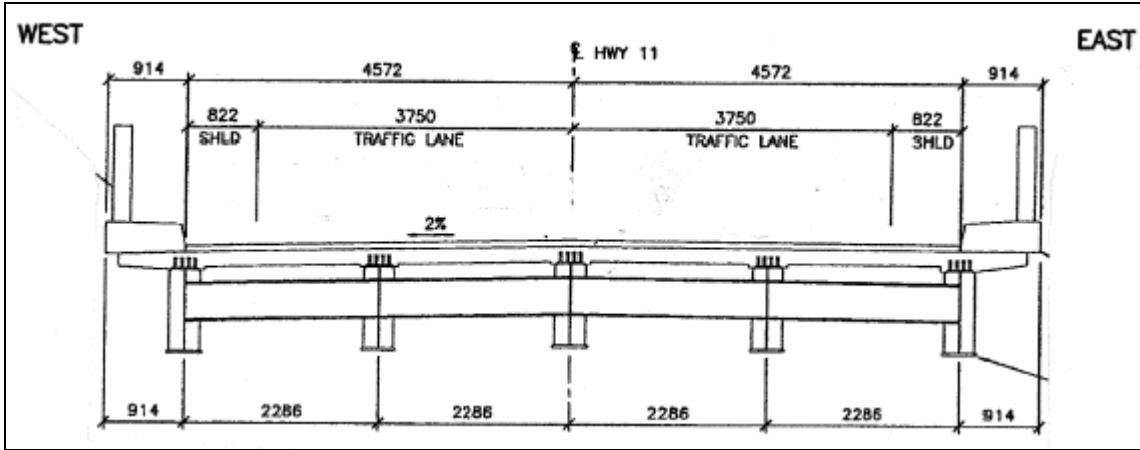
Transverse Section of existing bridge – CN Overhead at Rainy Lake, ON⁽⁴⁾
